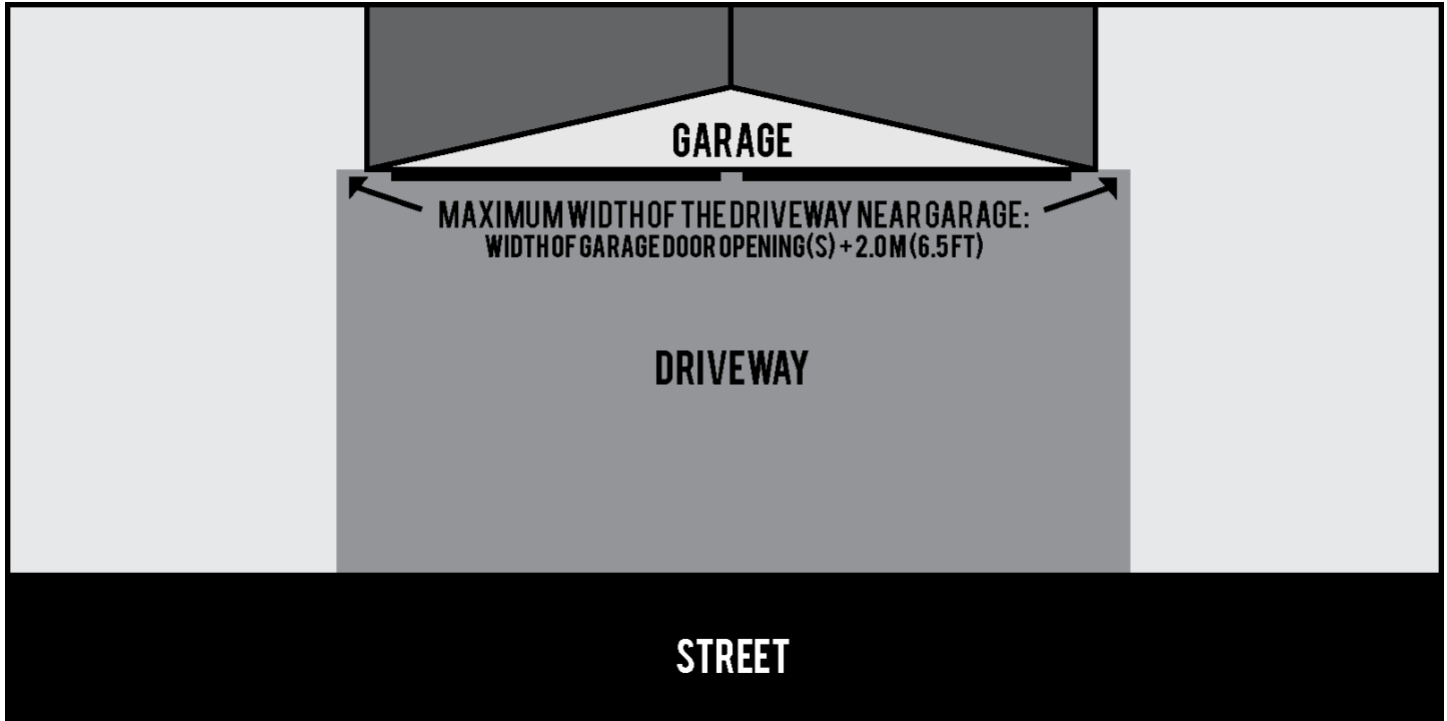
MAXIMUM DRIVEWAY WIDTH
